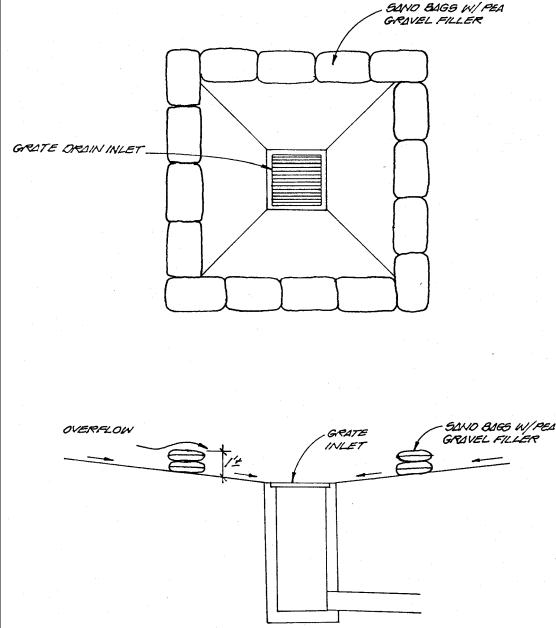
Diagram of Bagged Gravel Curb Inlet Protection (Pape-Dawson).
